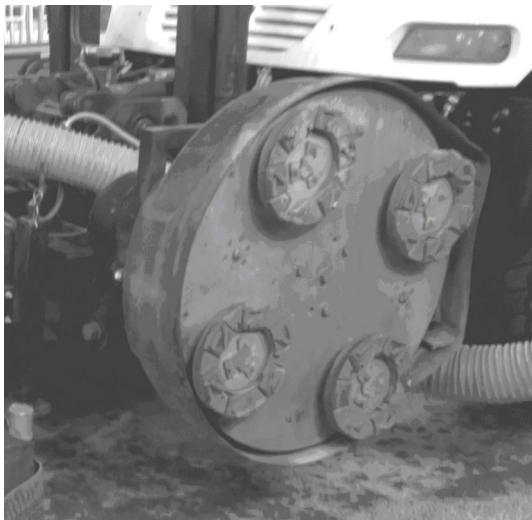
One of five rotating grinding discs on the road grinding machine of van Gompel BV with four integrated tool discs, which also rotate
